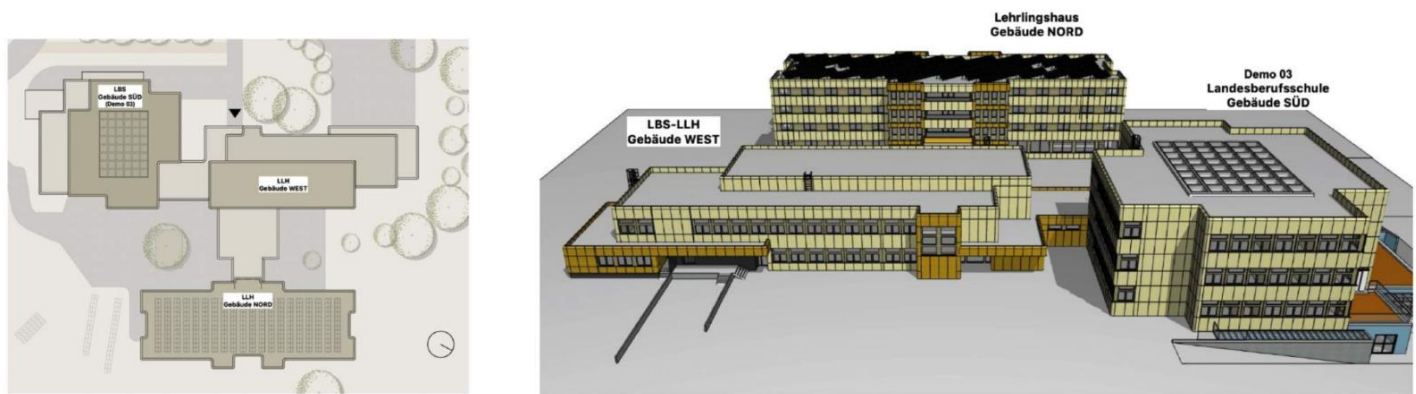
Top view (left) and 3D rendering (right) of the replication case buildings. Source: Nussmüller Architekten.
